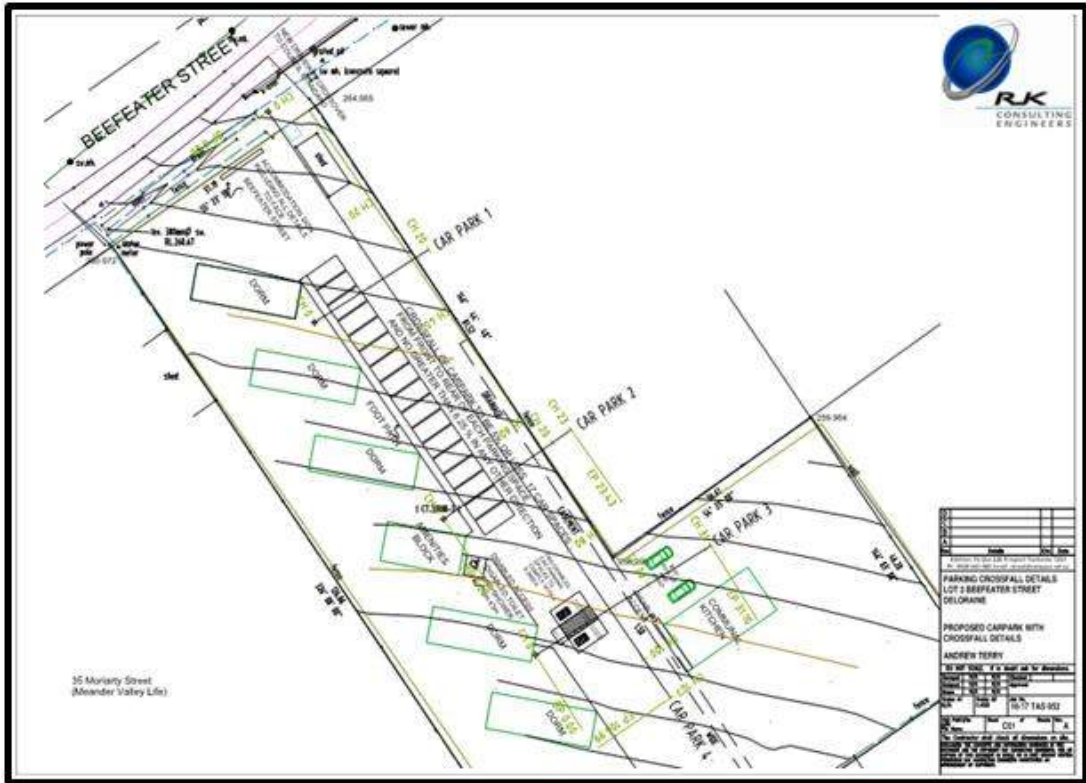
Proposed site plan (RJK Consulting Engineers, 2016)
